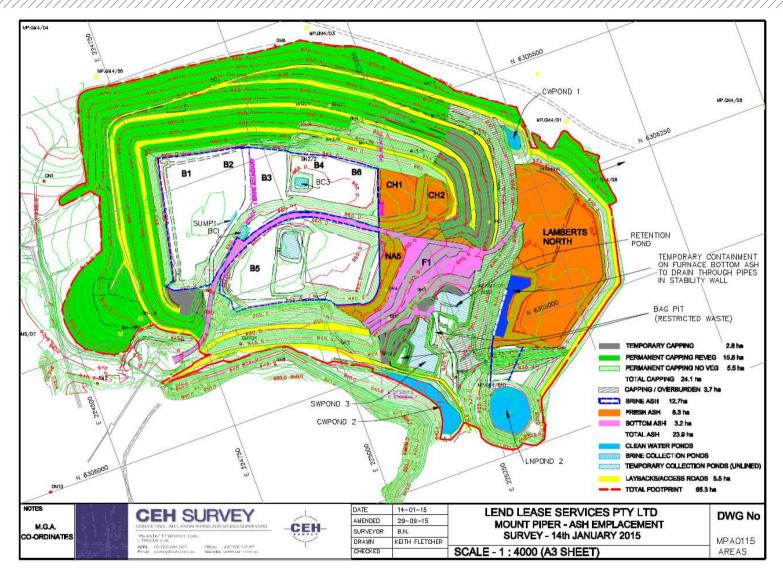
Mt Piper Power Station Brine Conditioned Ash and Lamberts North Placement (Orange) Area contours in January, 2015. Mt Piper Water Conditioned Ash Rainfall Runoff Pond (SW3) replaced by Retention Pond and Lamberts North Ash Runoff Pond (LN Pond 1, dark blue) replaced by Temporary Containment Pond, piped to lined Runoff Pond (LN Pond 2)
